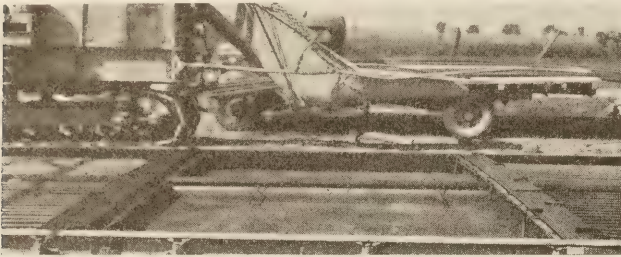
TYPE II JOINT IN PLACE ON THE SUBGRADE PREPARATORY TO PLACING CONCRETE.
